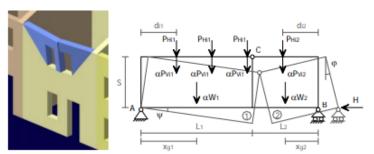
Horizontal wall flexion out-of-plane failure mechanism [112]
